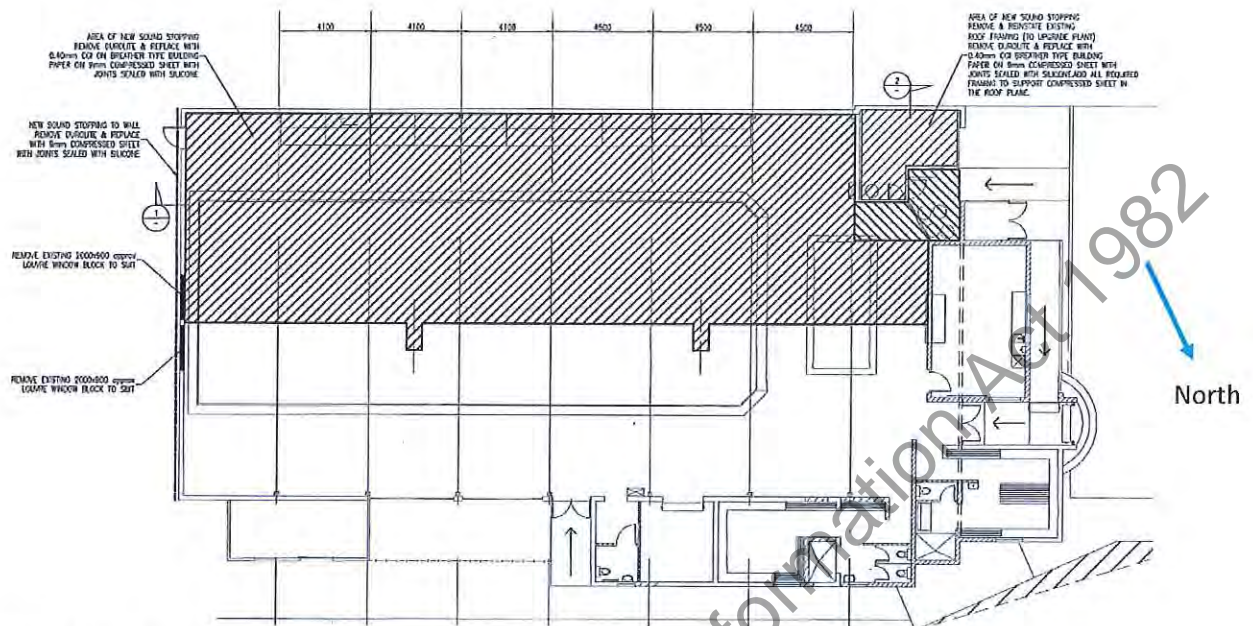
Floor plan showing extent of cement fibre sheeting (hatched), installed in 1999
